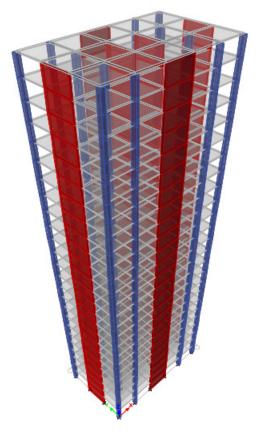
Orthogonal view of Flat plate with Shear wall model in ETABS
